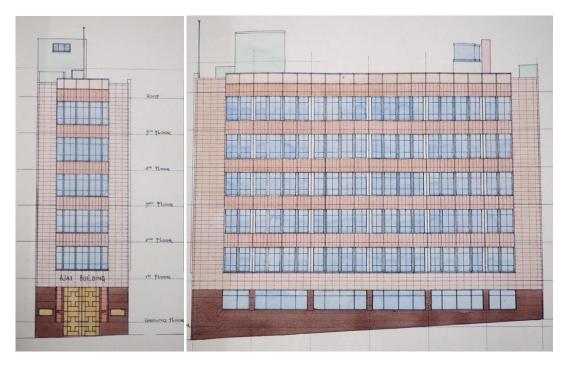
Original plans from 1955, showing the tile-clad Queen Street elevation (left) and Little Collins elevation (right) of the subject building at 103-105 Queen Street. (Source: PROV VPRS 11200/P7 unit 1066)
